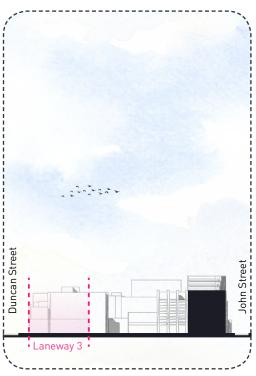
Enlarged Site Section A.B; 1:1,800 2006-2013, section
